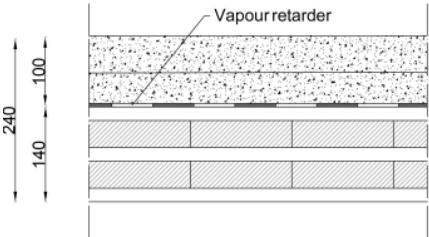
Cross-section concrete-CLT floor in mm (Baghdasarian et al., 2018)
